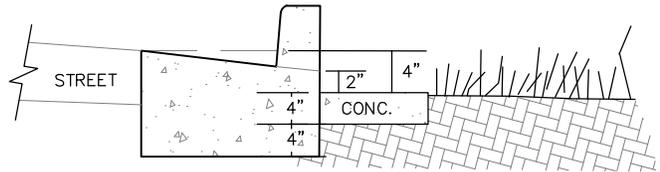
DETAIL A - WITH WINGWALLS AND CONCRETE PAD
